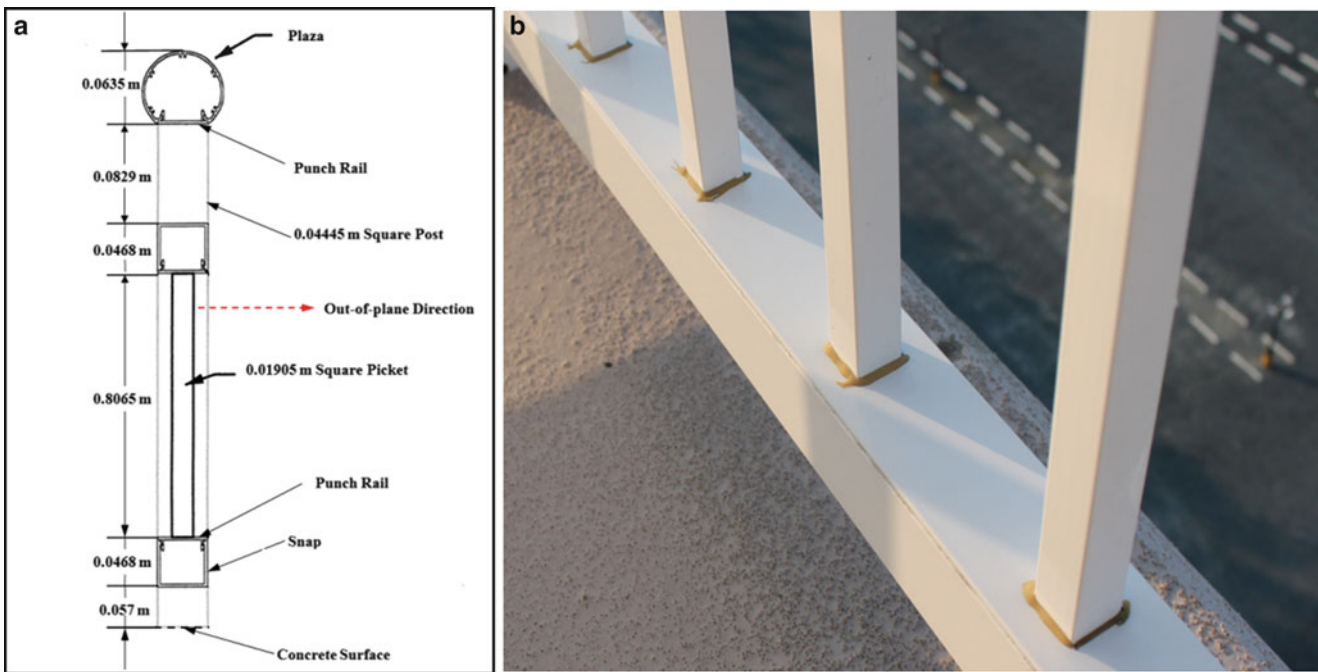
(a) Side-view schematic of a typical railing, and (b) damaged pickets with epoxy glue applied
